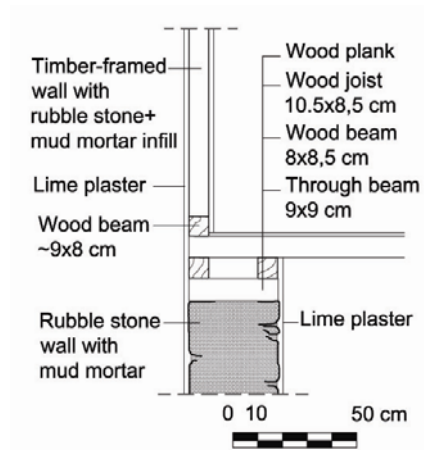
Connection detail of first floor joist with rubble stone wall (Şeyh Cami St. No: 32)
